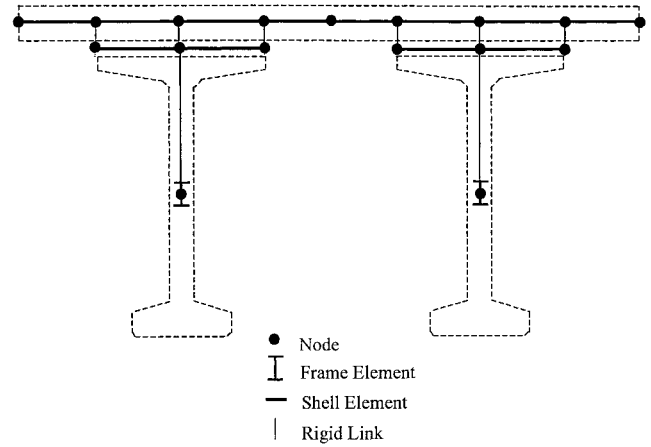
Cross Section of Finite-Element Model of Two Girders
